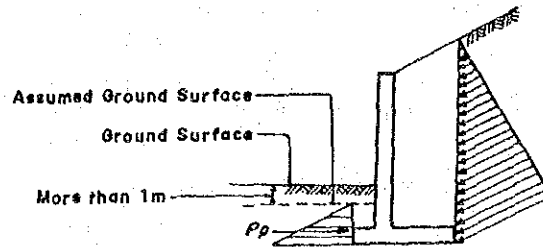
PASSIVE EARTH PRESSURE AGAINST SLIDING
